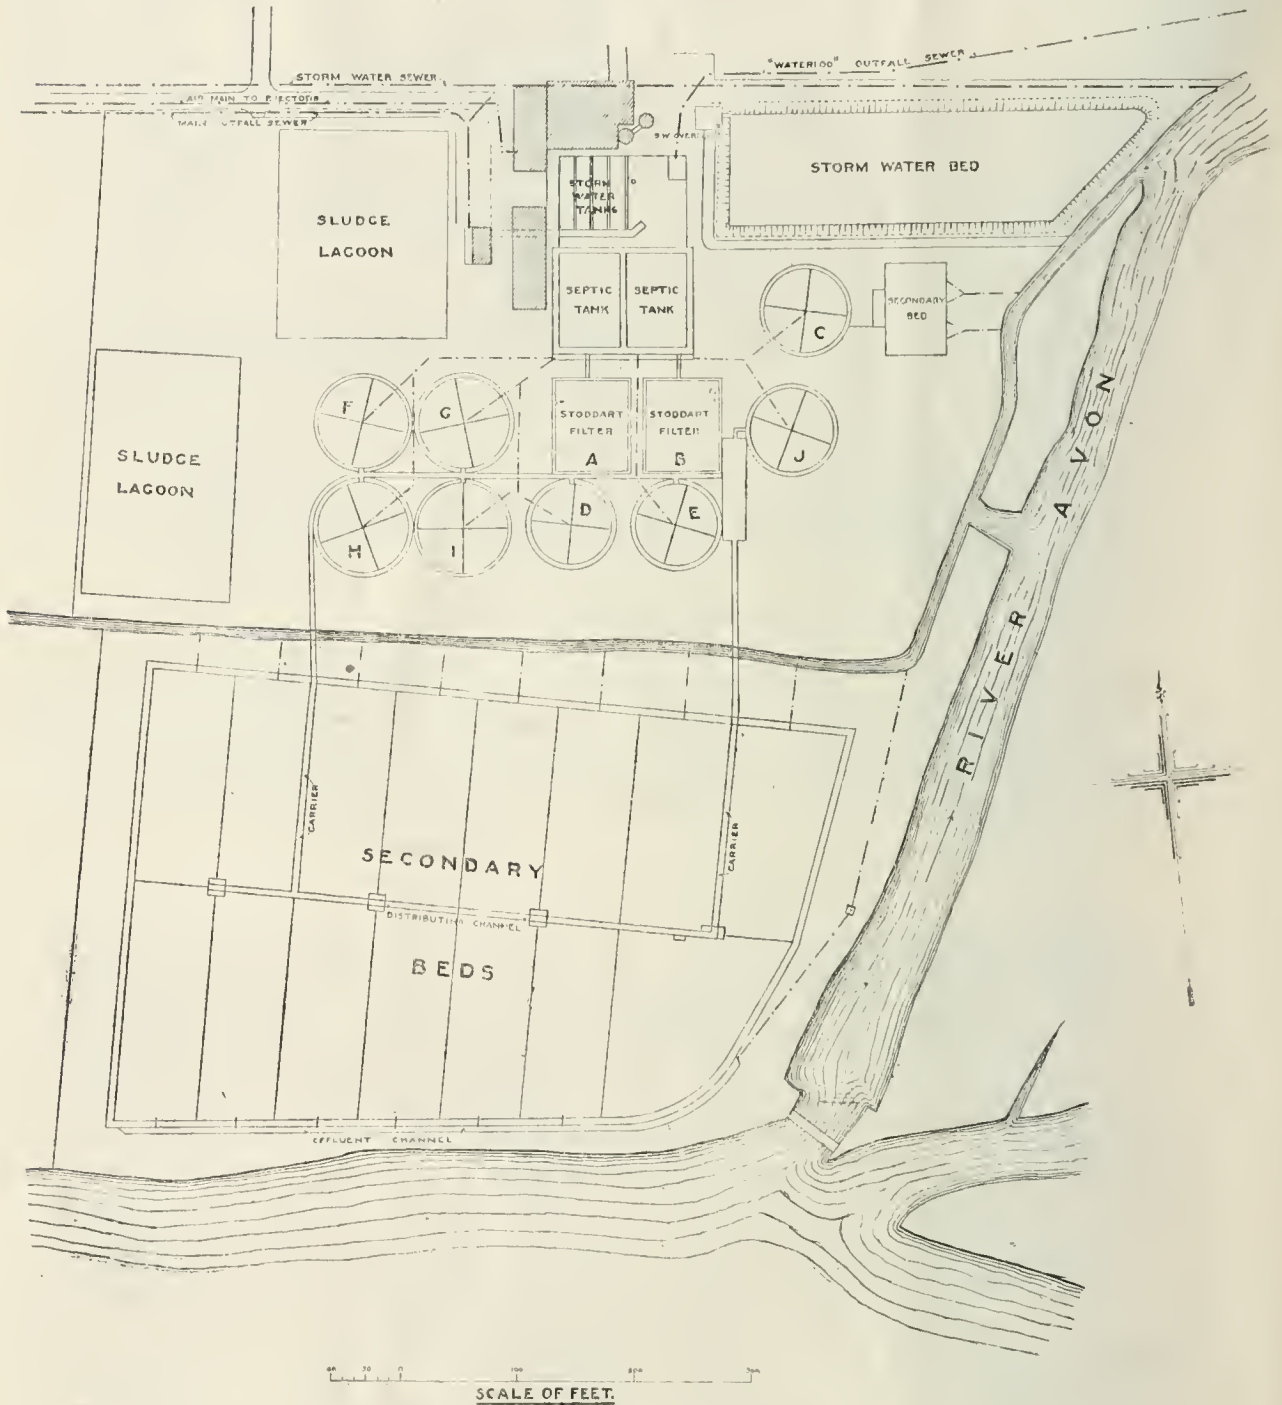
GENERAL PLAN OF SEWAGE DISPOSAL WORKS.
